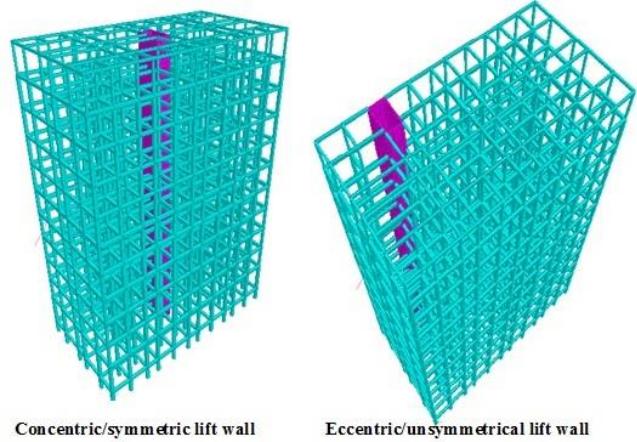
Modeling of the beam-column frame with concentric and eccentric lift wall
